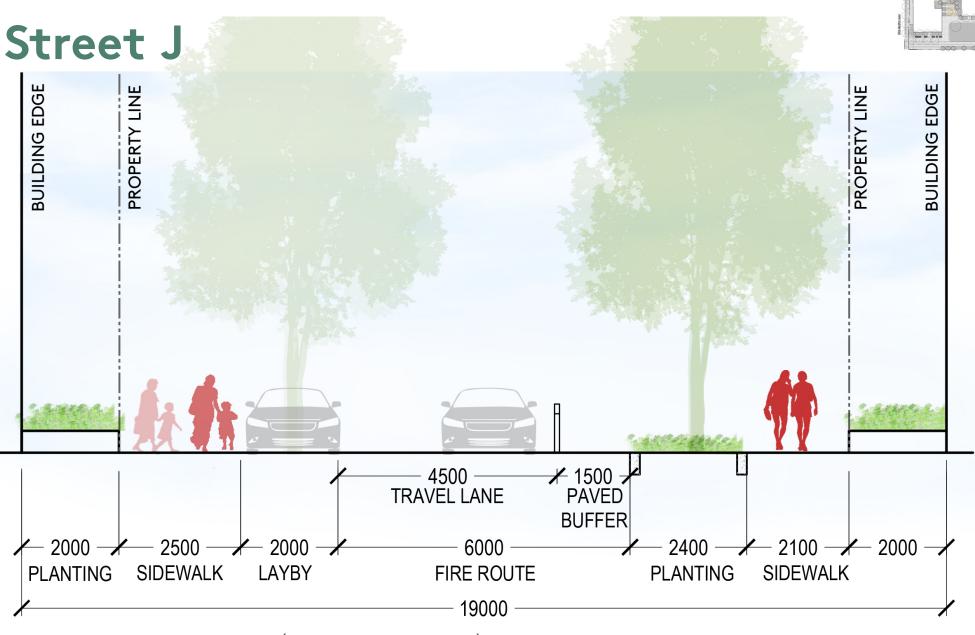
Proposed Public Street (Tubman Avenue Extension) Cross Section
